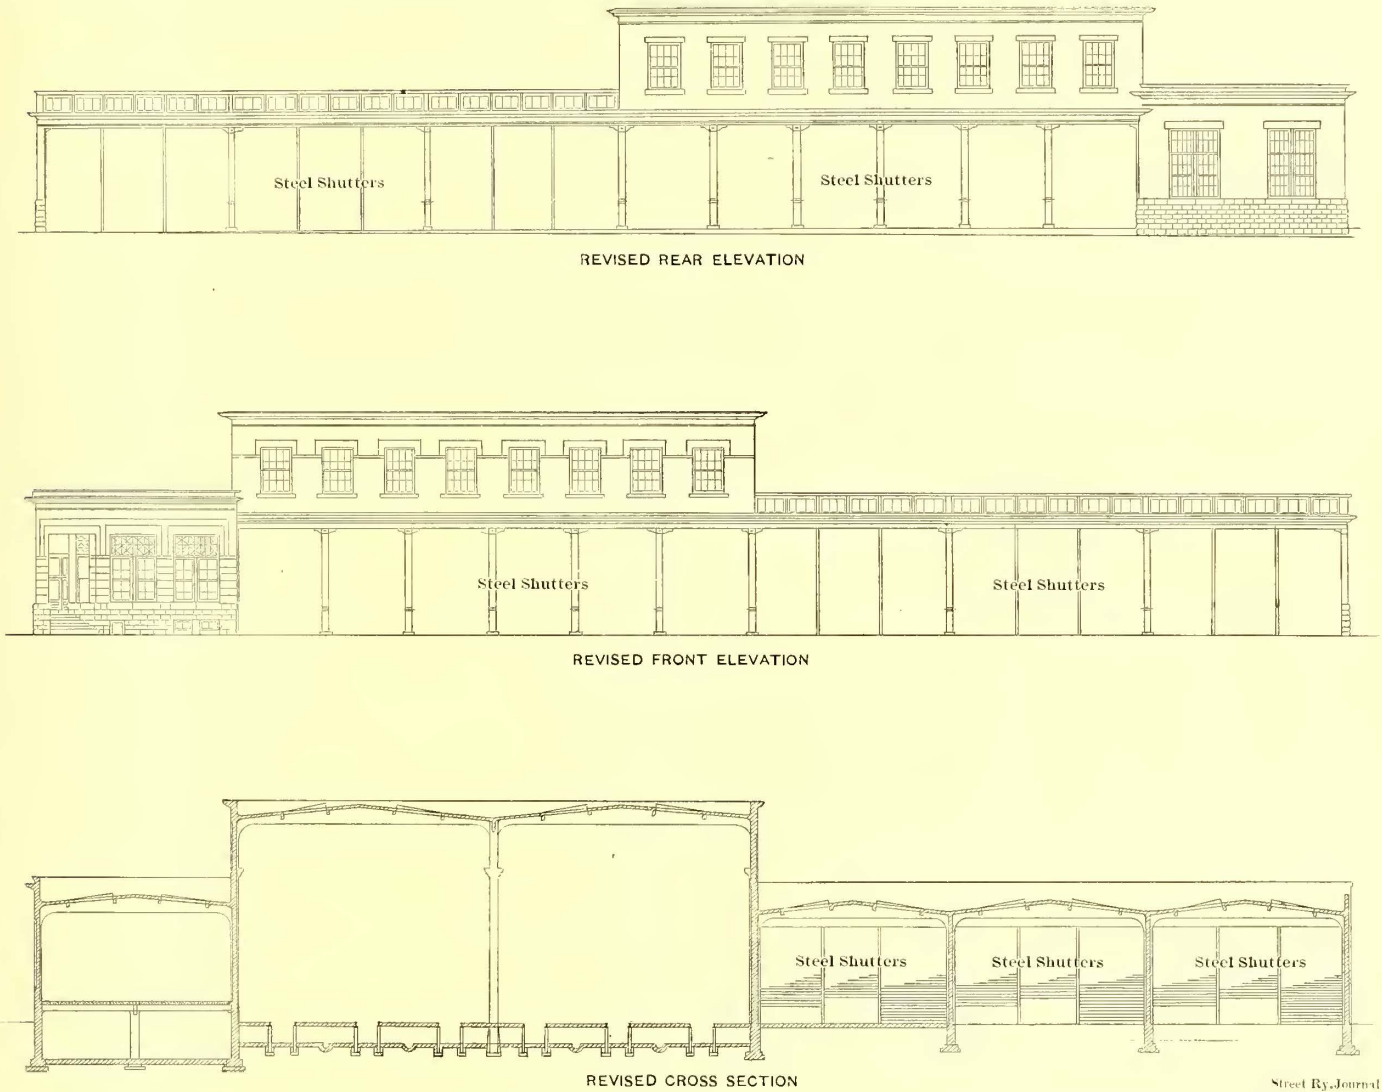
CROSS-SECTION AND ELEVATIONS—SNELLING AVENUE CAR HOUSE—TWIN CITY RAPID TRANSIT COMPANY
